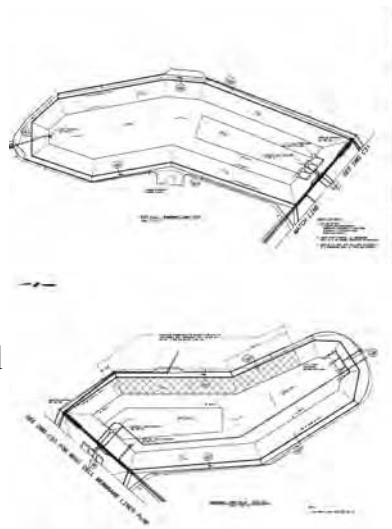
The west and east cell liner plans. The north slope of the east cell (below) did not require reinforcement, but a new drainage plan was required. The slope had suffered weeping that threatened to create instability over the long-term. A geocomposite made of a non-woven geotextile laminated to a geonet was selected.
